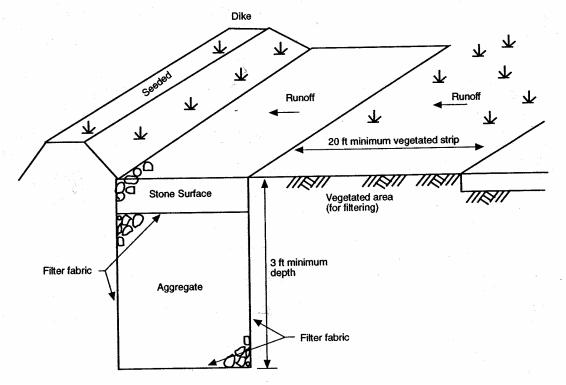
Infiltration trench (Livingston et al., 1988)
